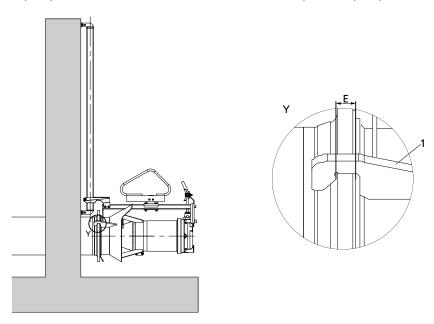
Mounting a new pump set to an existing guide rail and connection pipe
